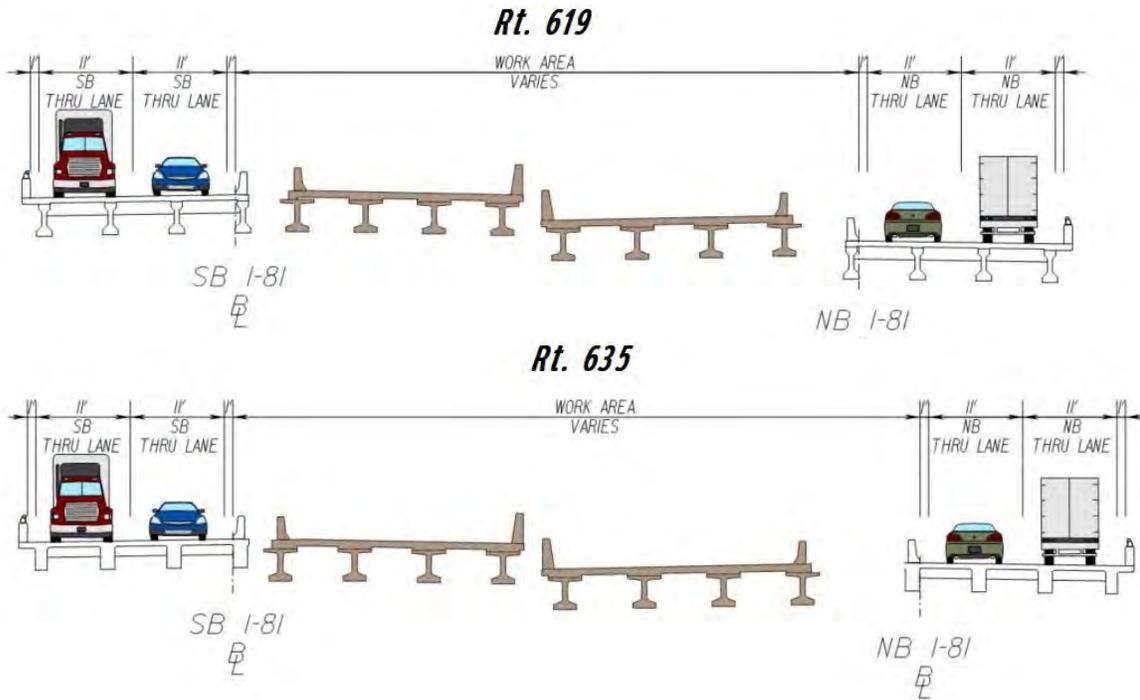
Stage 1B Construction Bridge Replacement RT 112, RT 619 and RT 635
